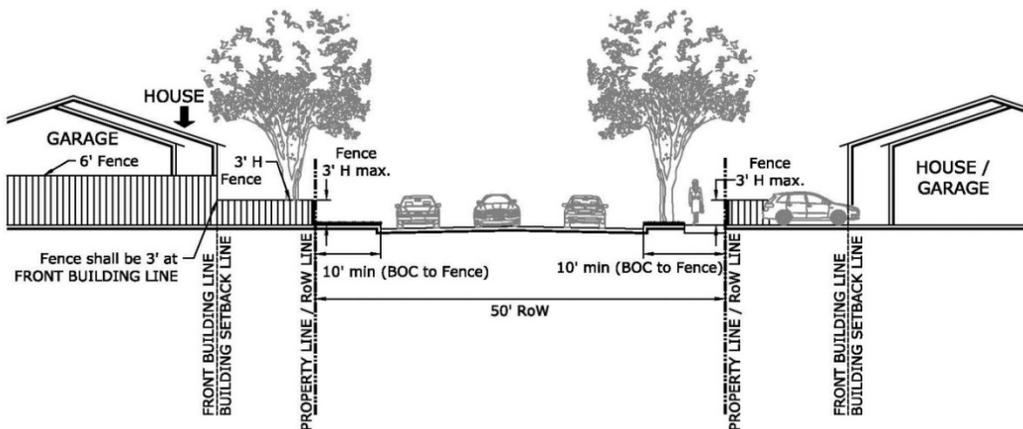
(e) – Typical Cross Section with NO Landscaped Area and Sidewalk
